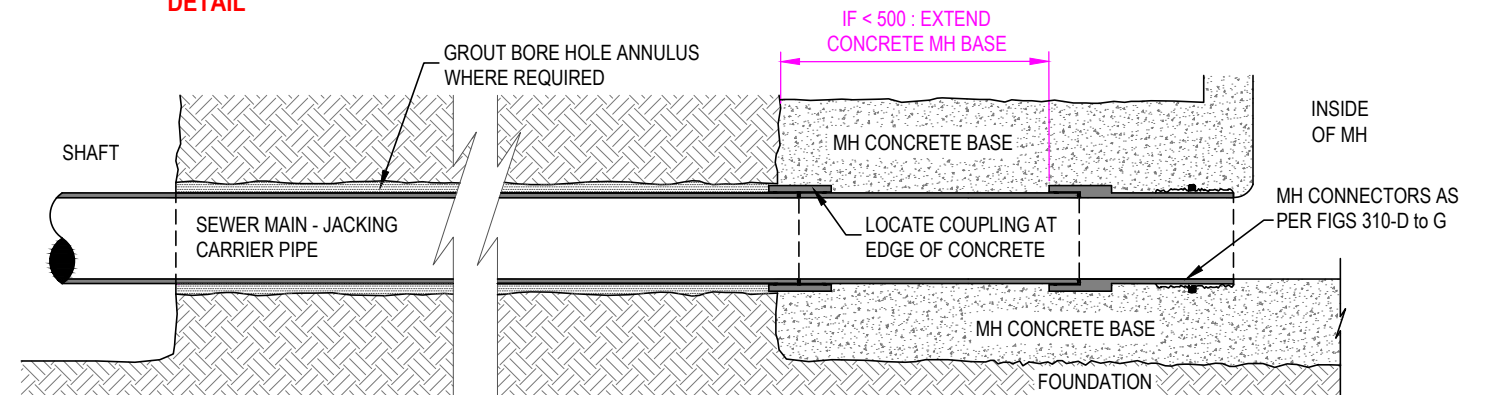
B-C: TYPICAL JACKING CARRIER PIPE INSTALLATION SHOWN WITH MH CONCRETE TO EDGE OF BORE SHAFT
